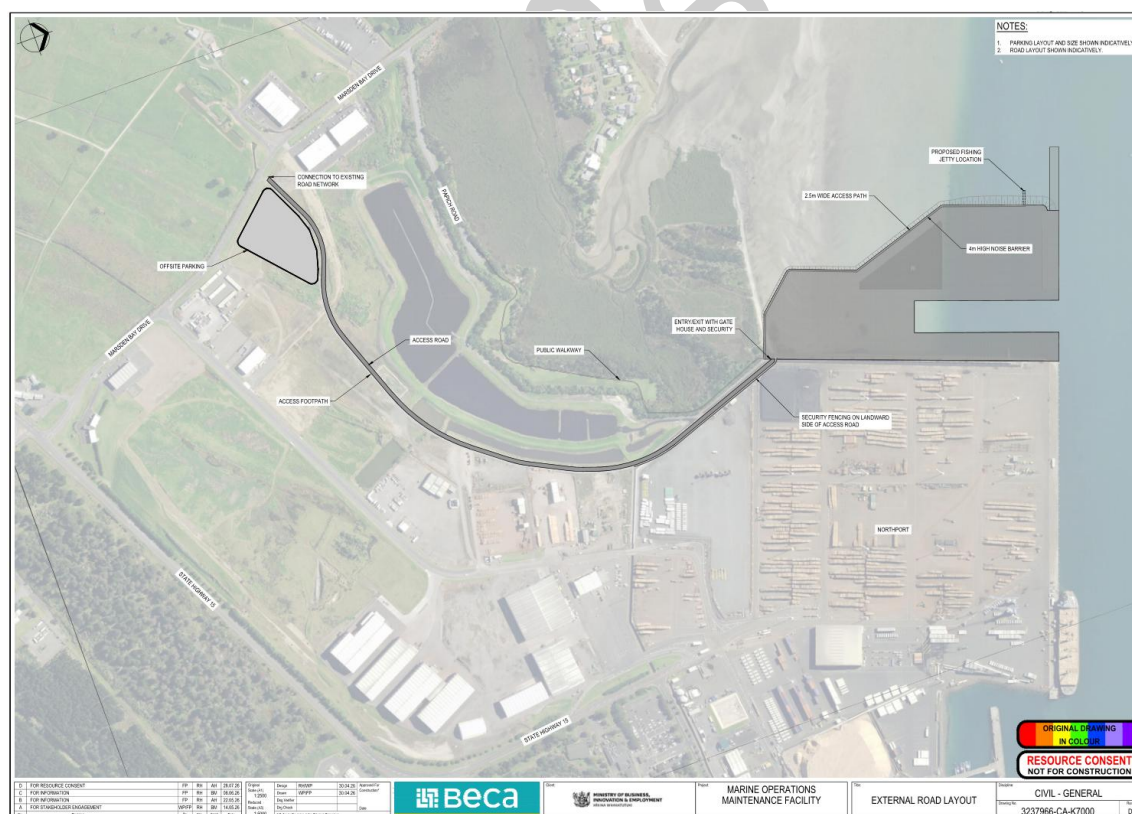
Location of proposed road and carpark from Marsden Bay Drive (Source: Appendix 6 of the Substantive Application: Concept Design and Construction Report, BECA 2026).
